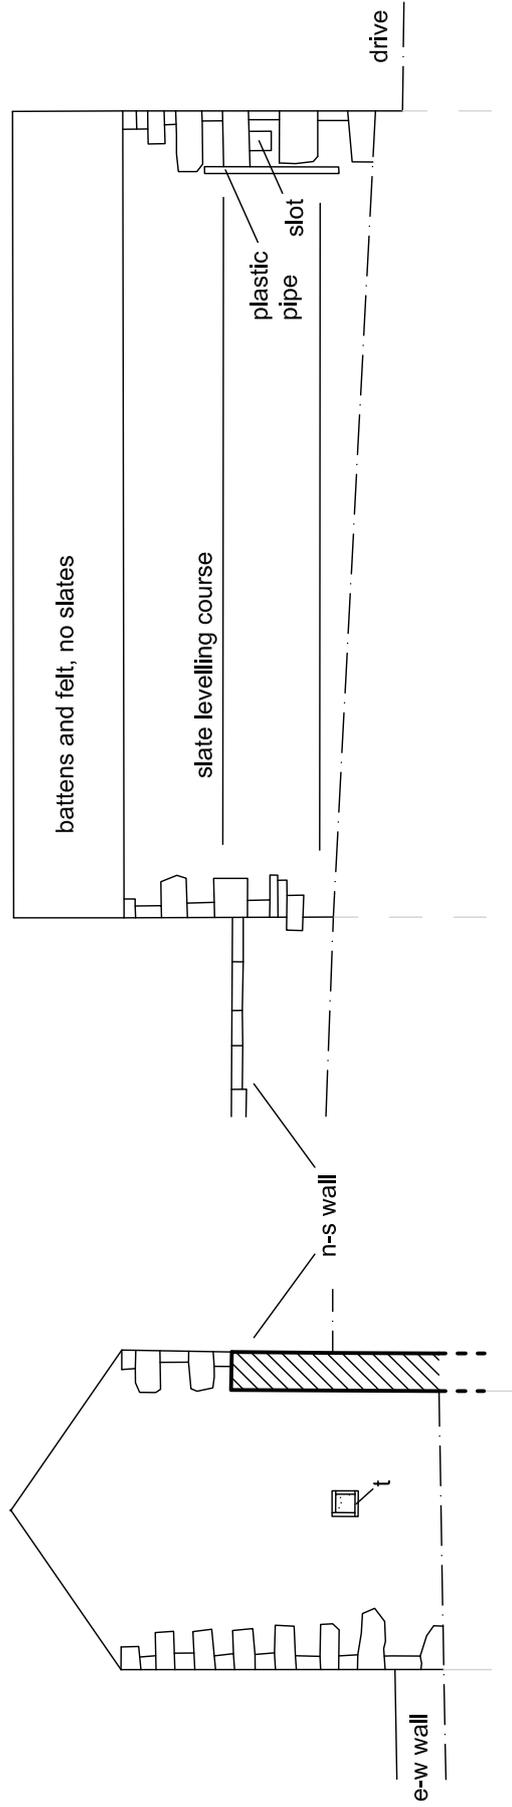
North and south external elevations of Buildings 2-4 and Outshut 4a
